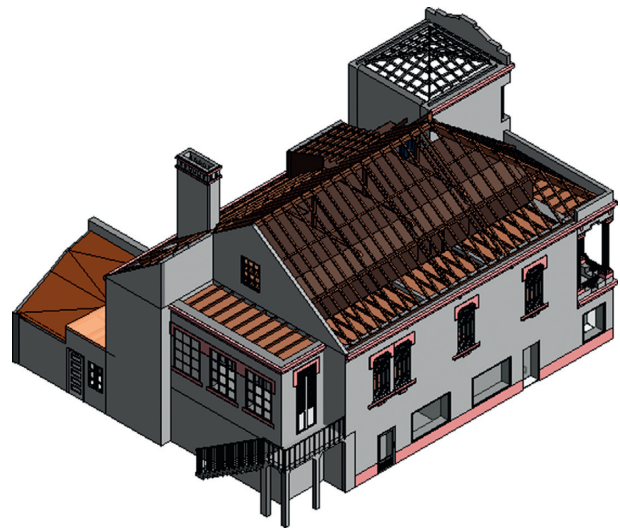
3D view of the BIM model (rear and left elevation).
